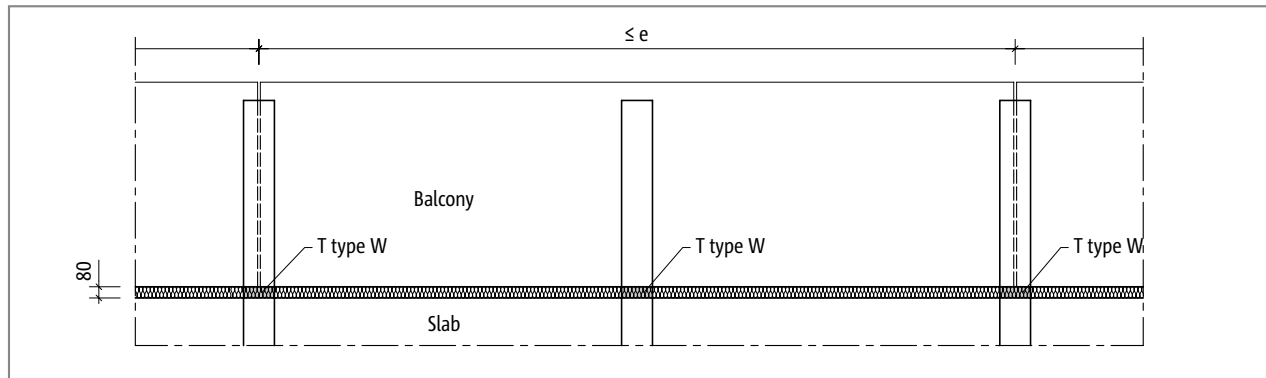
Schöck Isokorb® T type W: Expansion joint spacing
